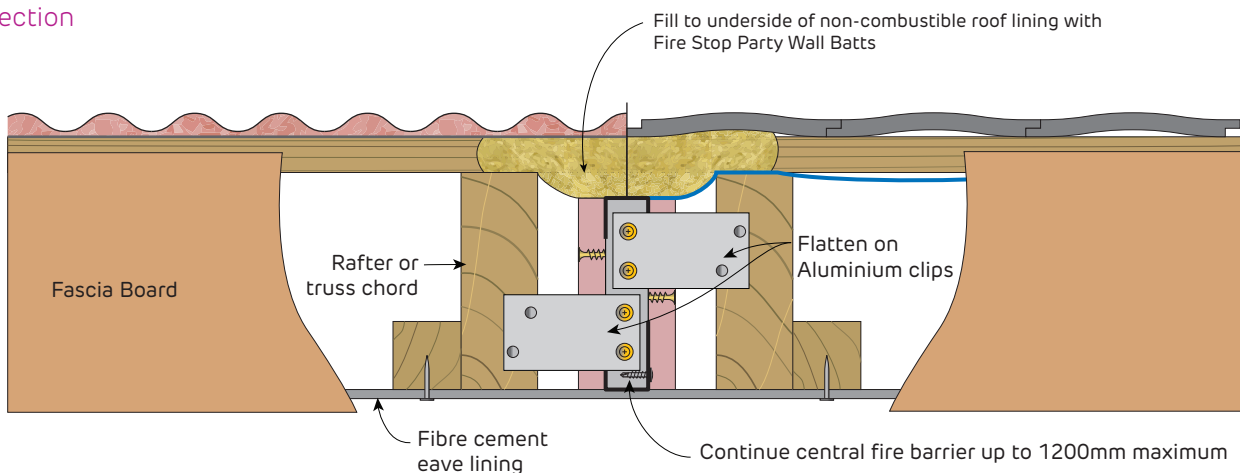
Interhome over Eave End Detail for Class 2 Buildings
